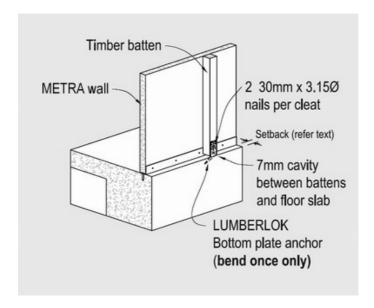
External Wall Tie Down Details - Concrete Floor
